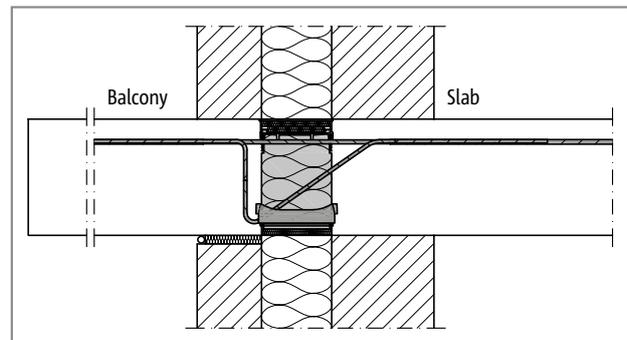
Schöck Isokorb® XT type K: Cavity wall with a balcony at inner slab level
